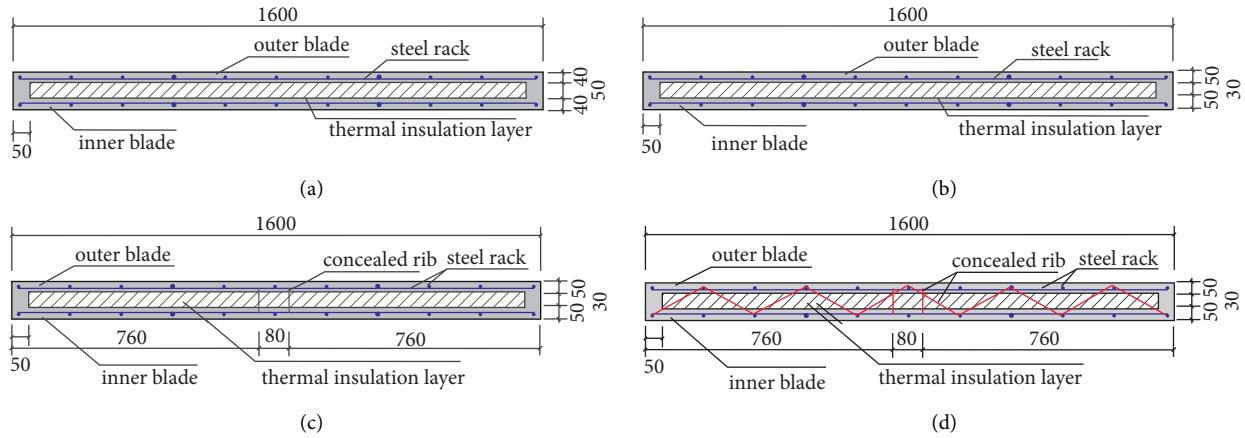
Horizontal section of wallboard: (a) Slab 1; (b) Slab 2; (c) Slab 3; (d) Slab 4.
